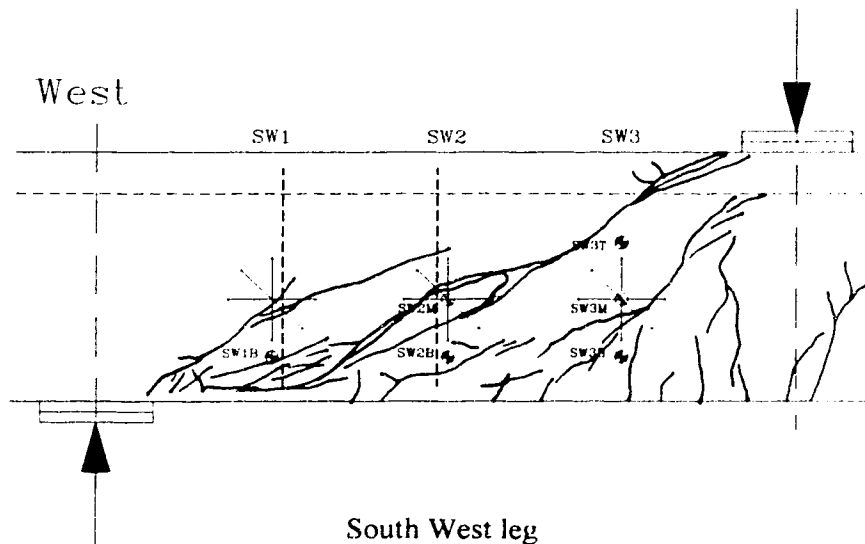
Girder 2, East span - Crack patterns
